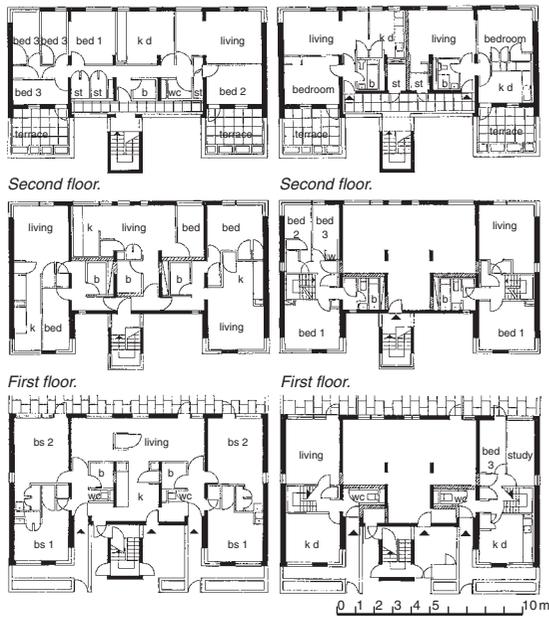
PSSHAK, Adelaide Road. Sample plans: solid lines show the support structure; hatched areas show demountable party walls; open blocks show the “kit” (reproduced with approval from *AJ*, 21/5/75, p. 1073).
